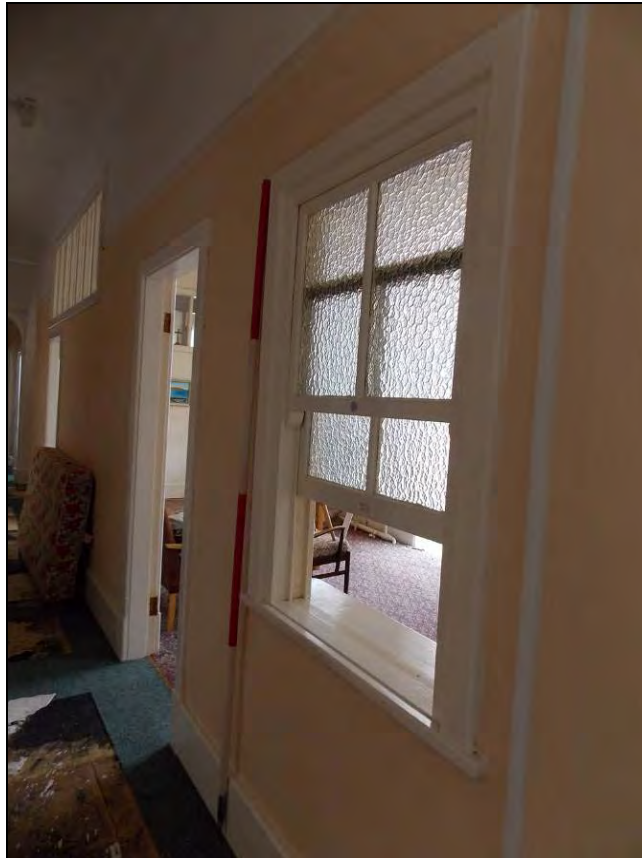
Corridor with doorway and windows to the southern meeting room, looking east (scale 2m).
